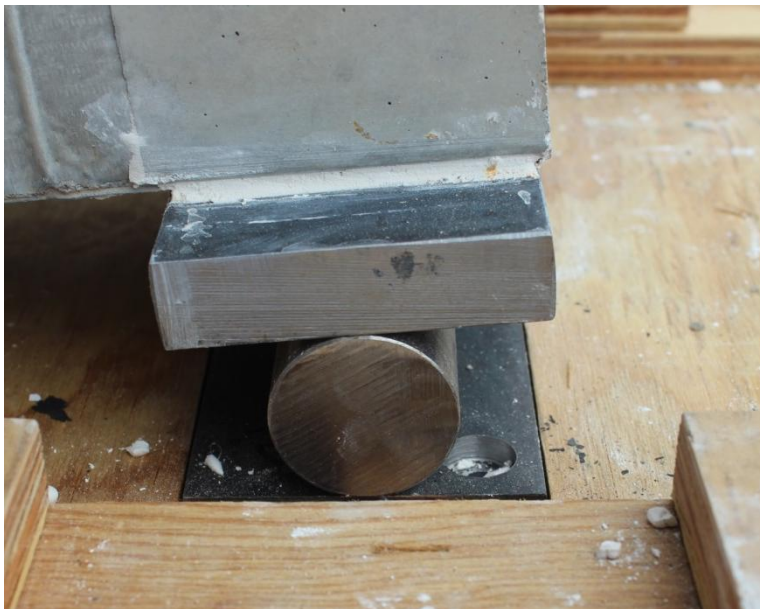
Beam Testing Setup: Roller Support Configuration
